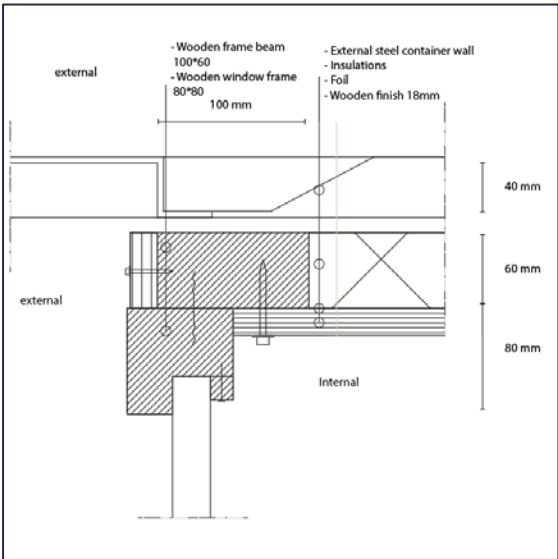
; Detail 3; horizontal section of the connection of the wooden frame with the internal façade
